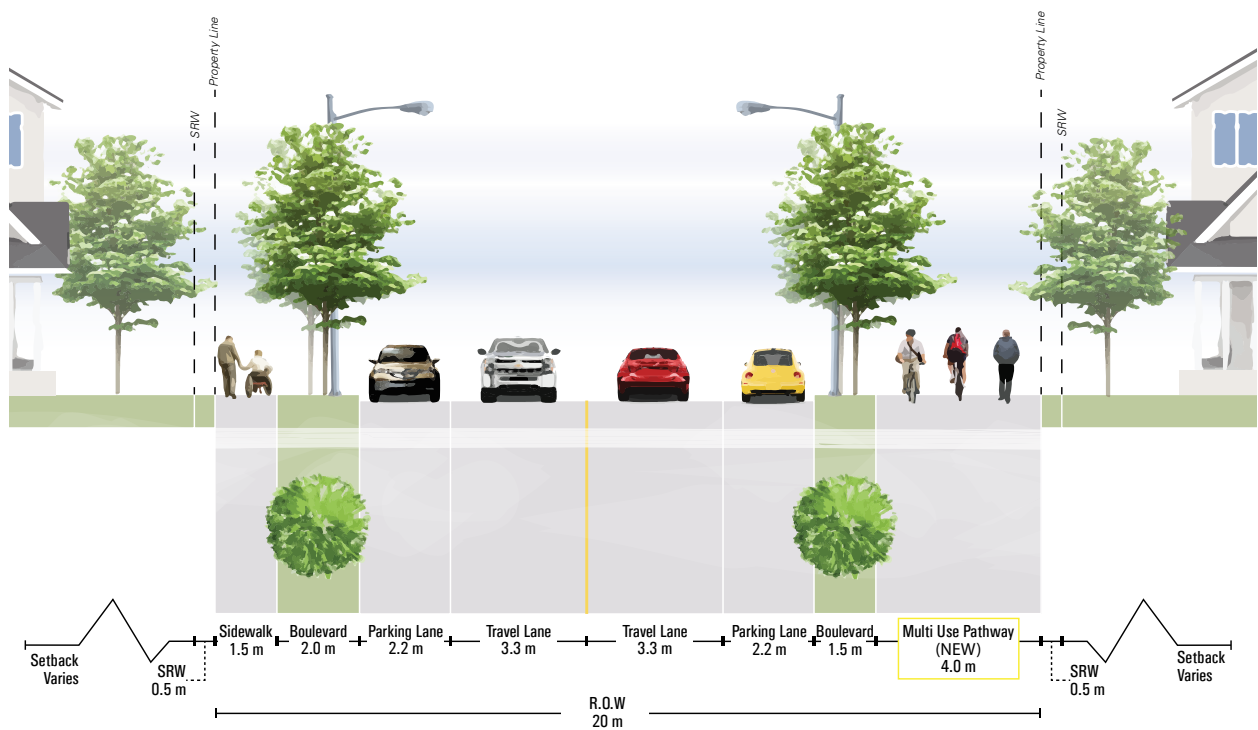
C 61A AVENUE FLEX ROAD (136 STREET TO KING GEORGE BOULEVARD)
